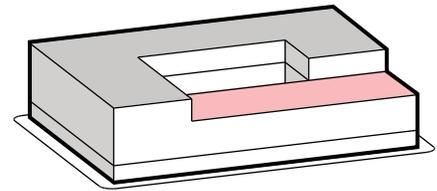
BE5 - REDUCTION IN FLOOR PLATE AREA OF UPPER FLOORS
